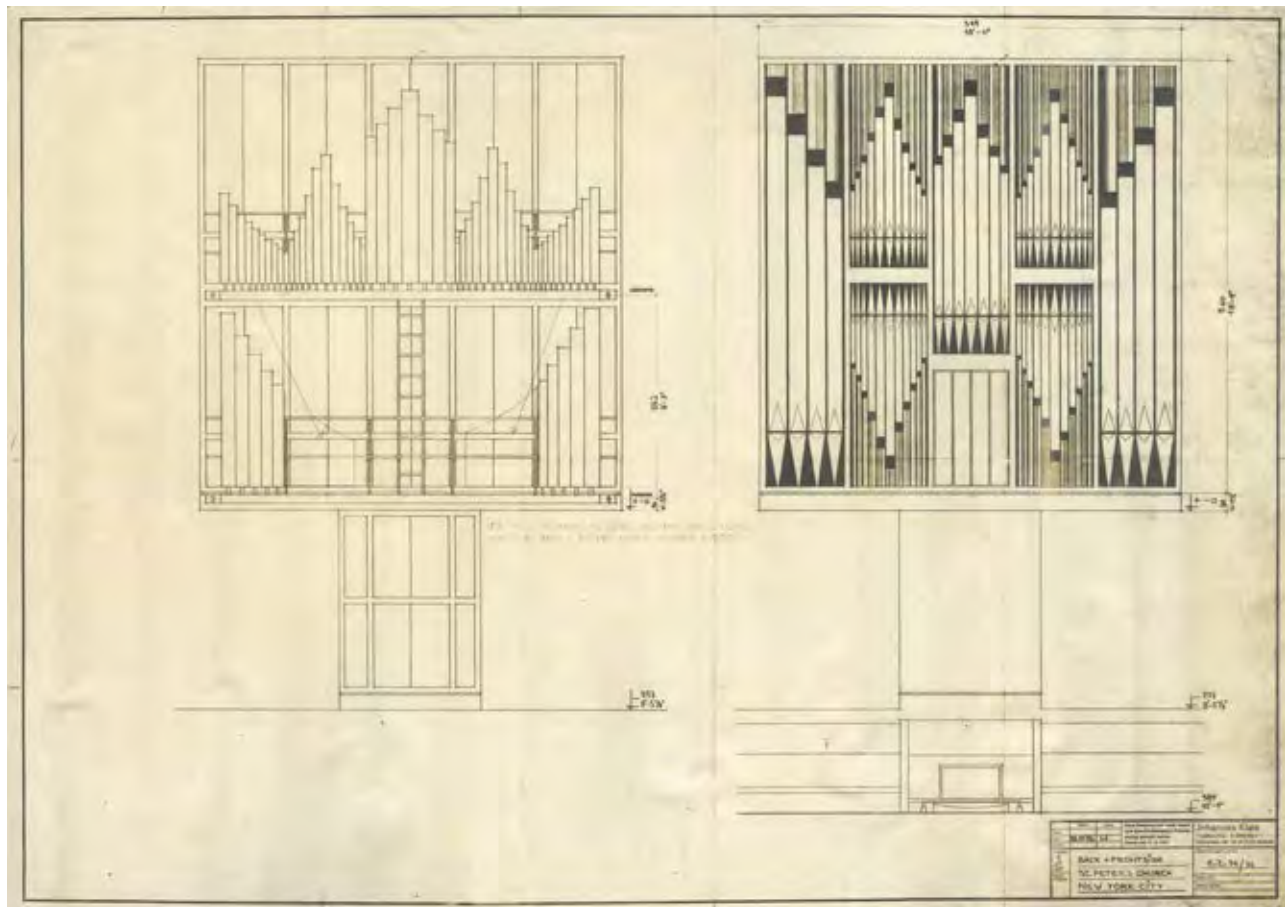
Organ elevations, Klais Orgelbau, 1975; source: Vignelli Design Center Archive
